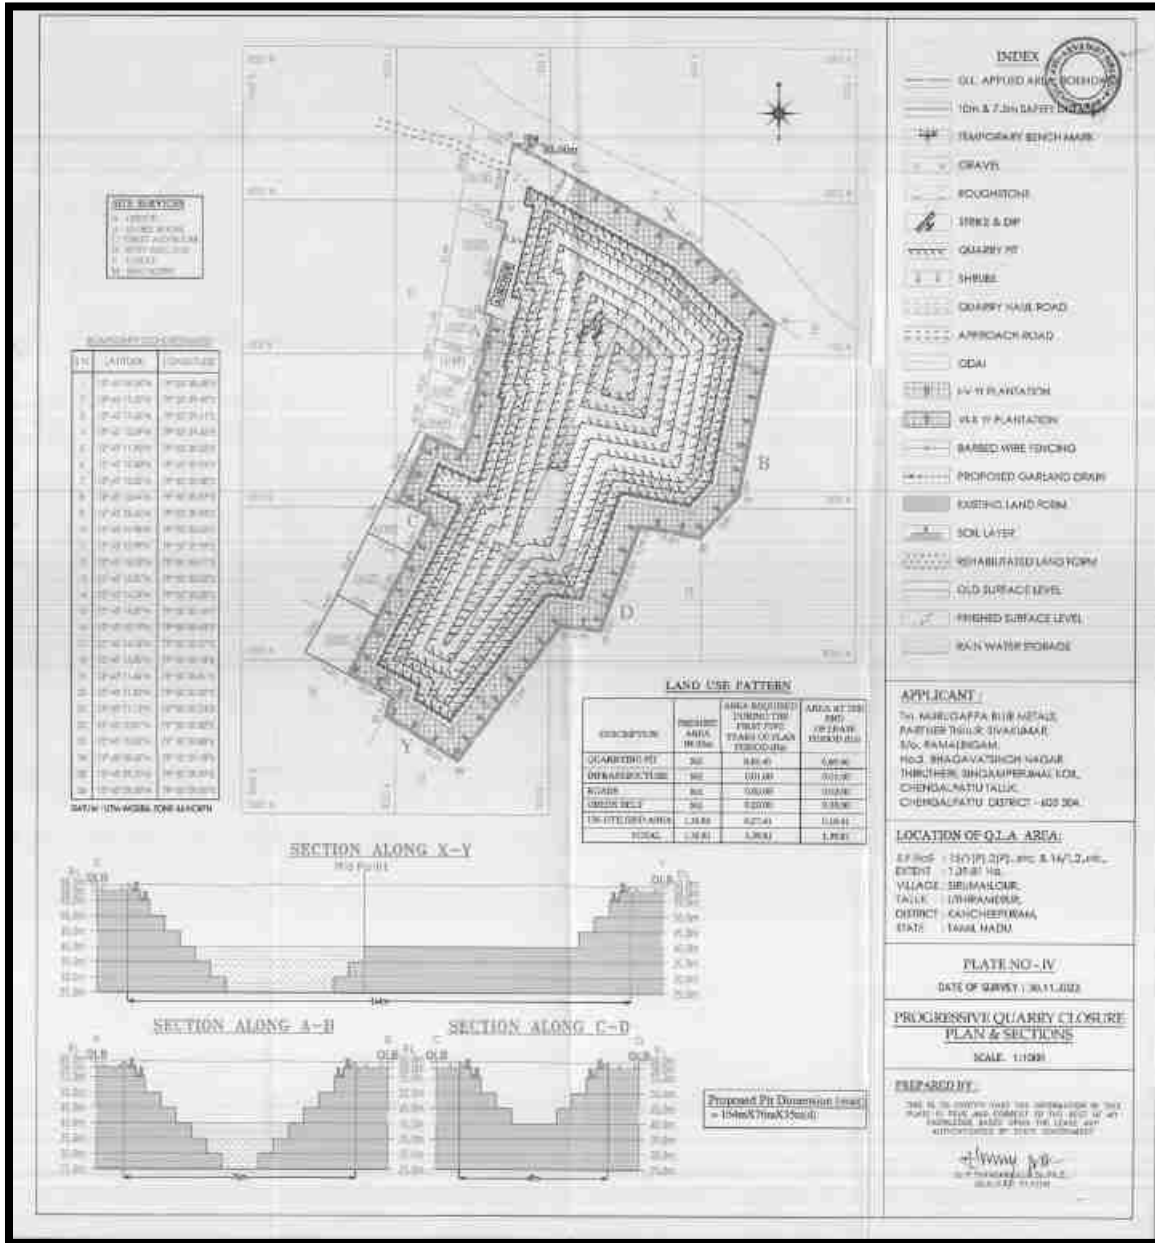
CLOSURE PLAN AND SECTIONS – P1
